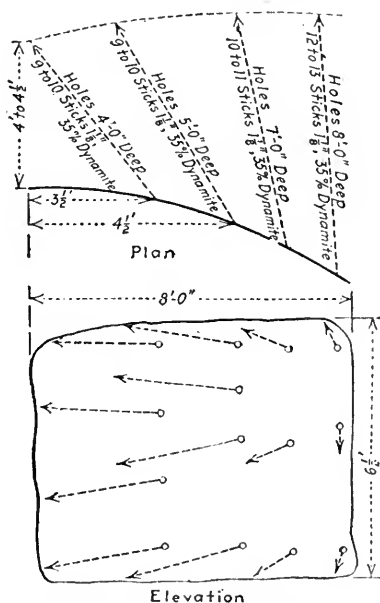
SOUTHEASTERN MISSOURI SIDE CUT FOR DRIFTS.
